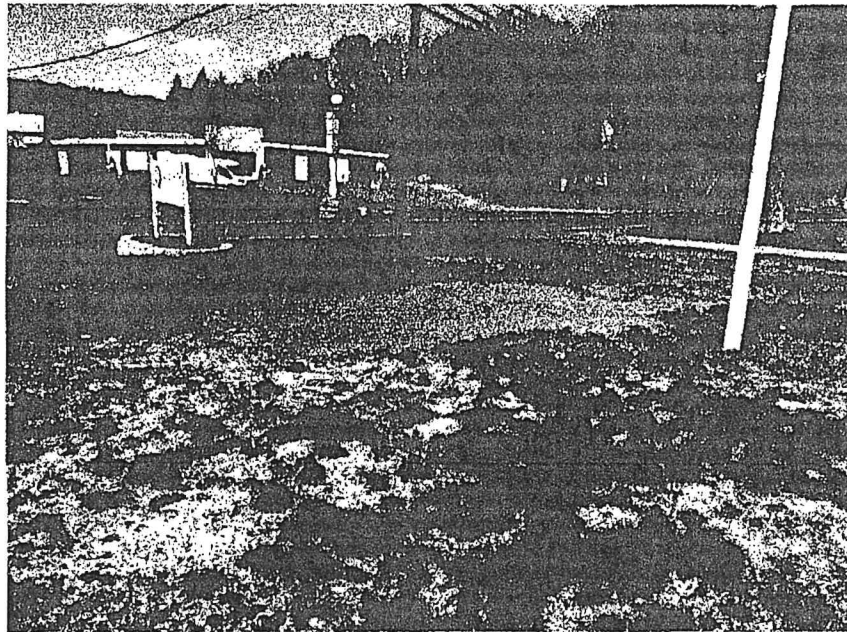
Excavation area at GP-1 (Confirmation Sample S-1)
